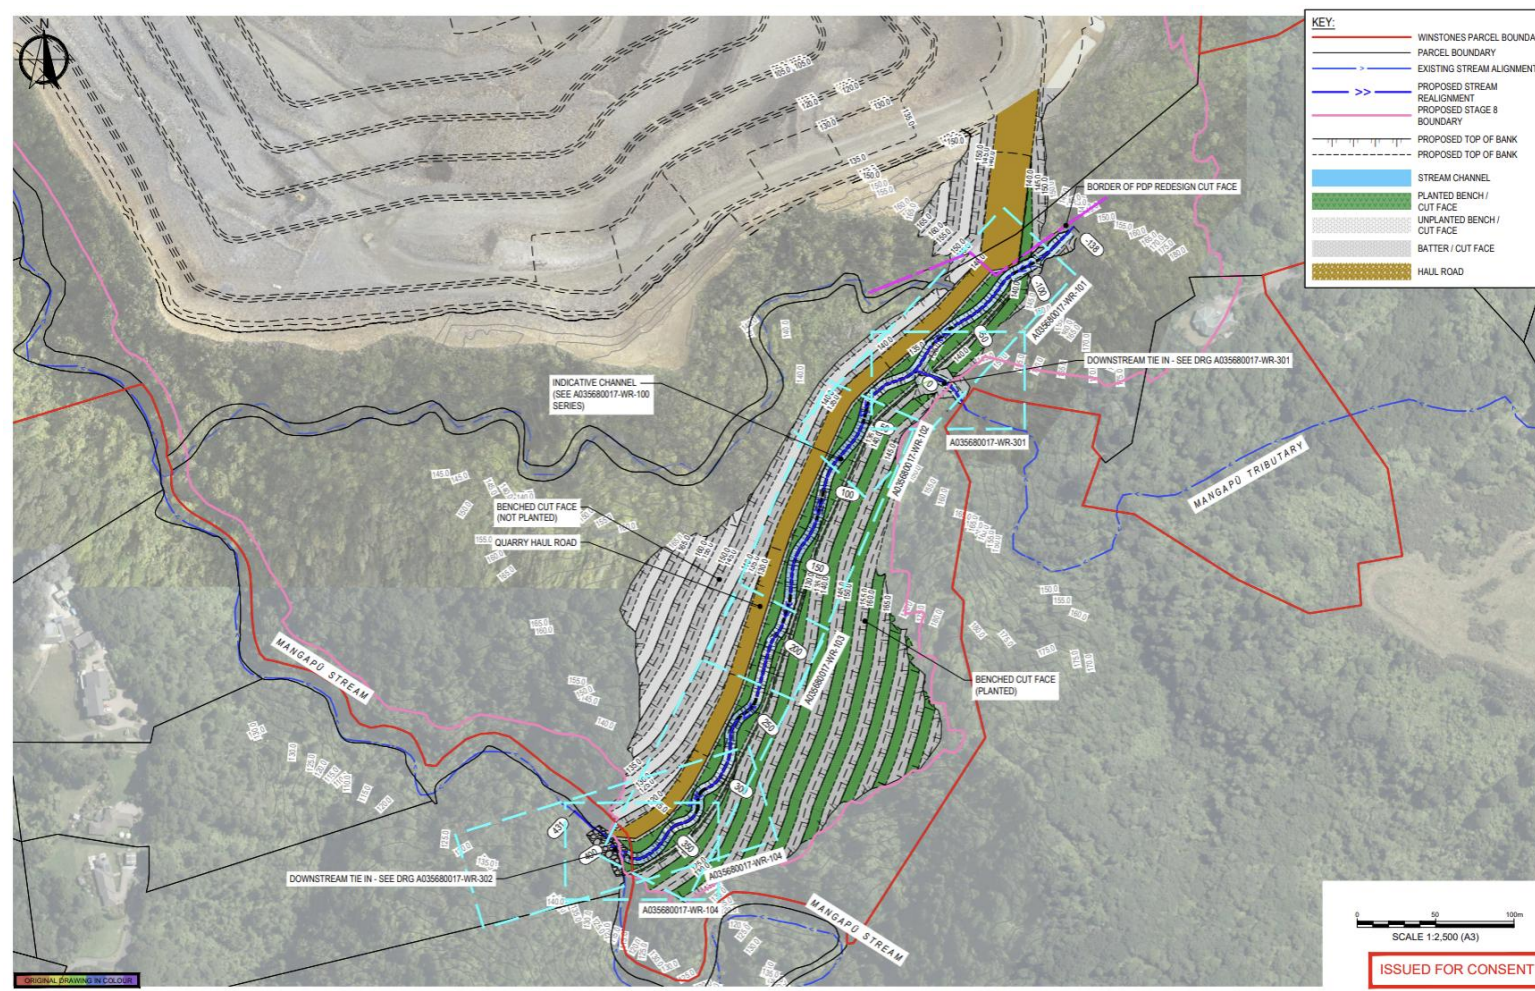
Plan showing the detailed works for Stage 1 (source: PDP)
